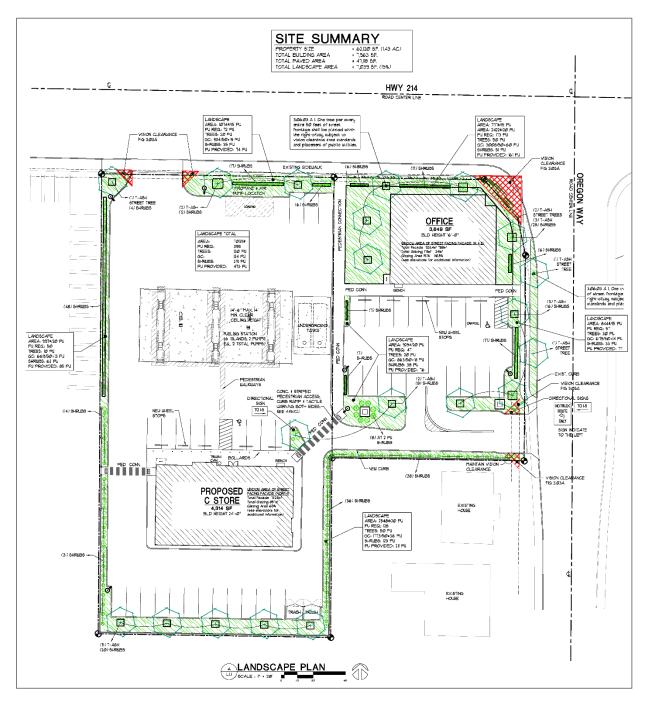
Option 2 Site Plan Excerpt Prior to Revision per Conditions of Approval
